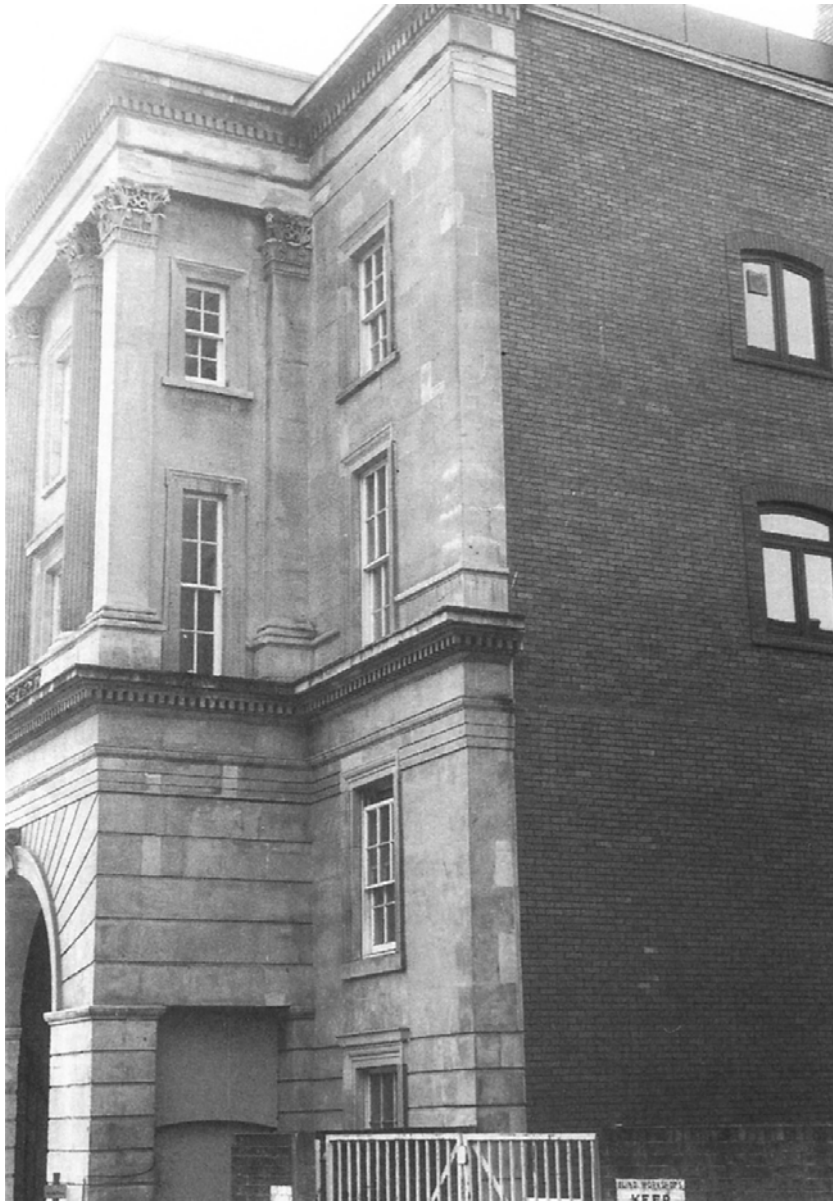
Side elevation of Brunel House in Bristol, England. A classic example of retaining a historic façade and how it meets up with new construction.
